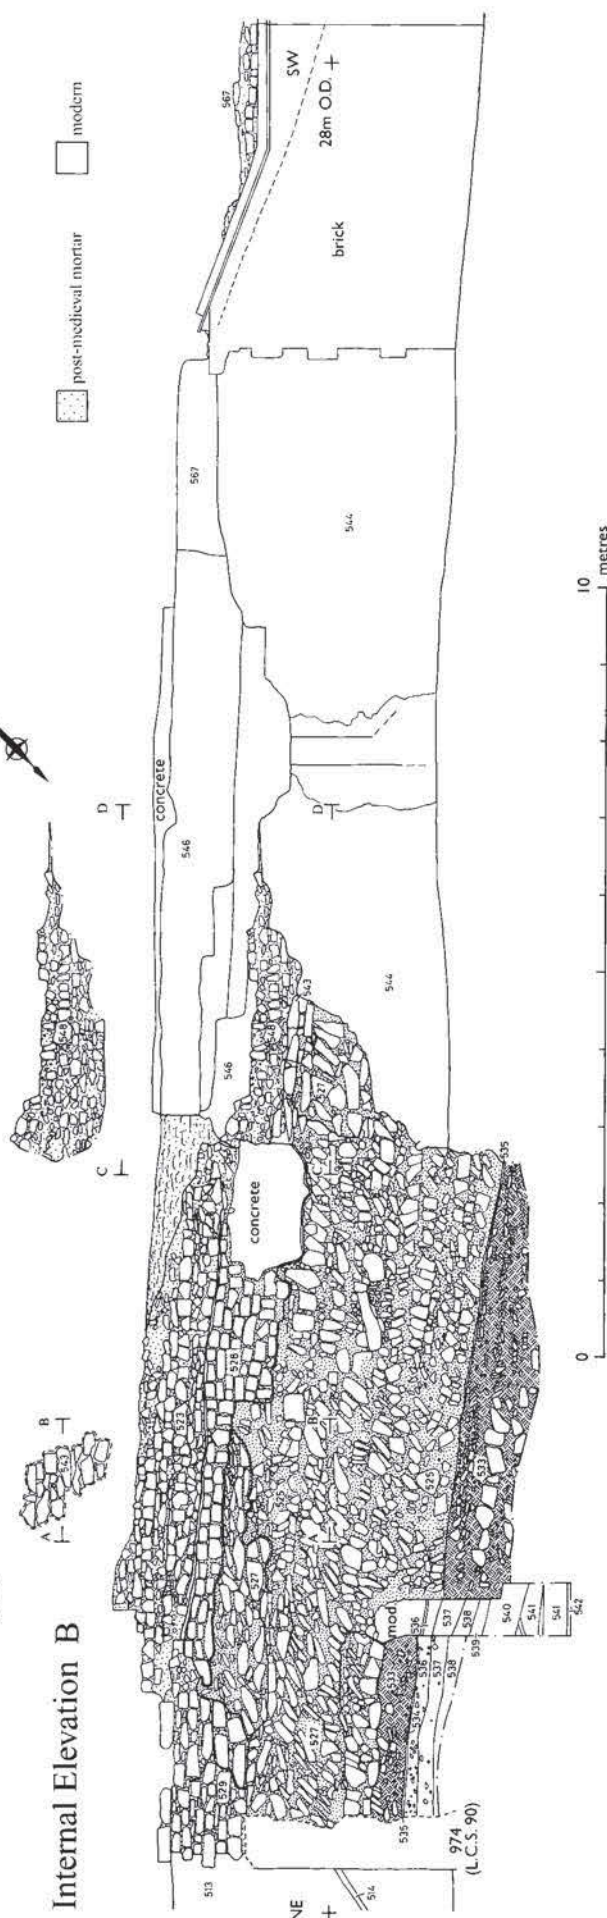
Western Way-Watergate plan, internal elevation B. Scale 1:100.
